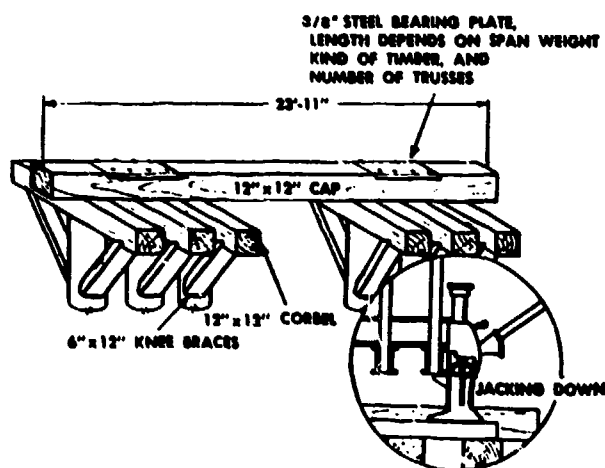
Construction of pile caps for intermediate supports under panel bridges without end posts or bearings. Corbels and knee bracing added to provide a jacking platform for light bridges.
